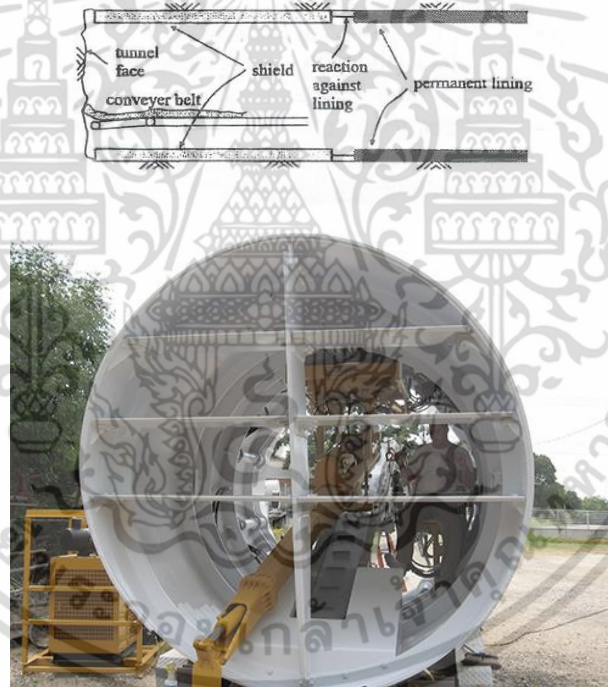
Schematic view of shielding during tunnel excavation. [12]
